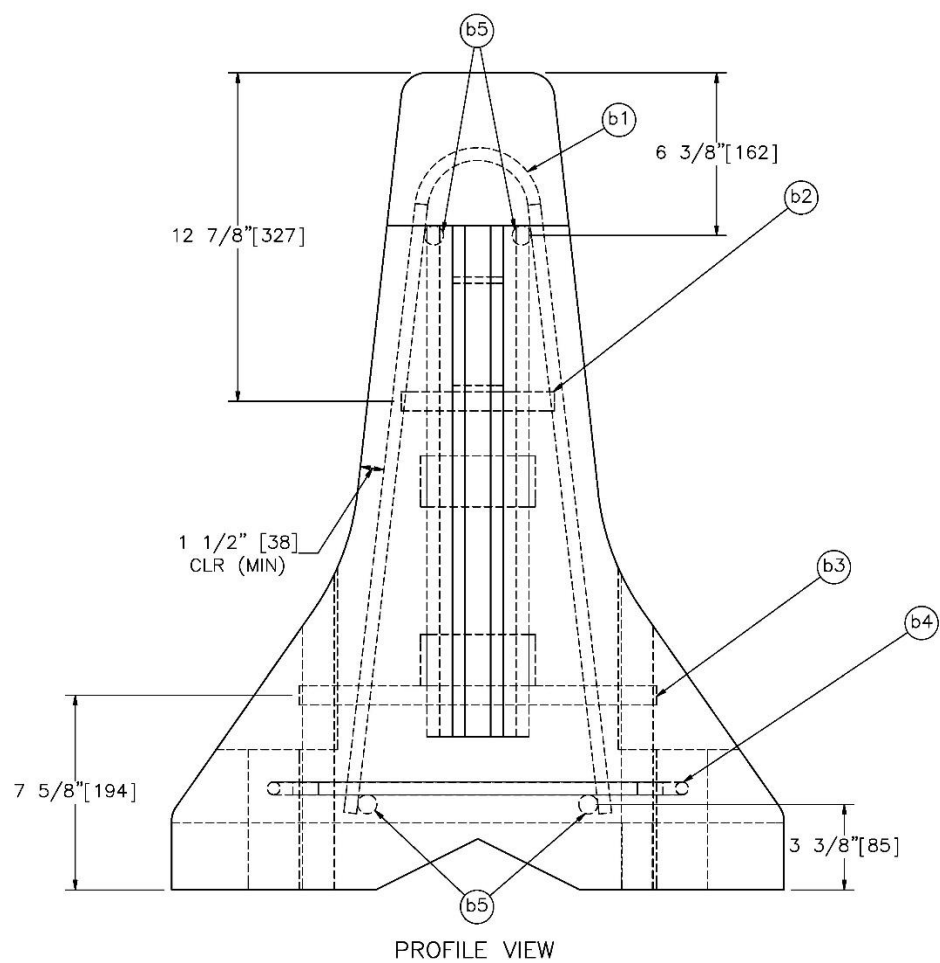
PCB Reinforcement Details, Test No. NJPCB-6
